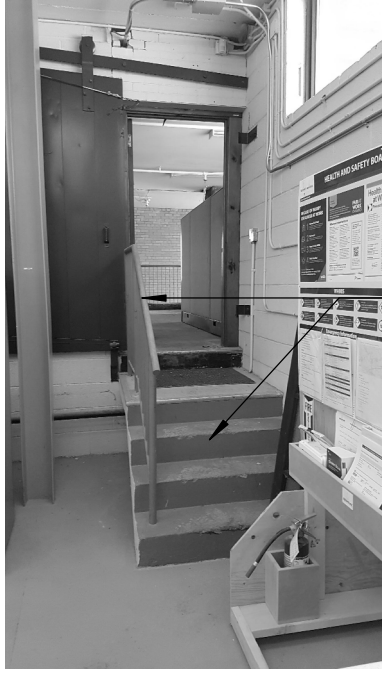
REMOVE EXISTING HANDRAILS FOR STAIR B
